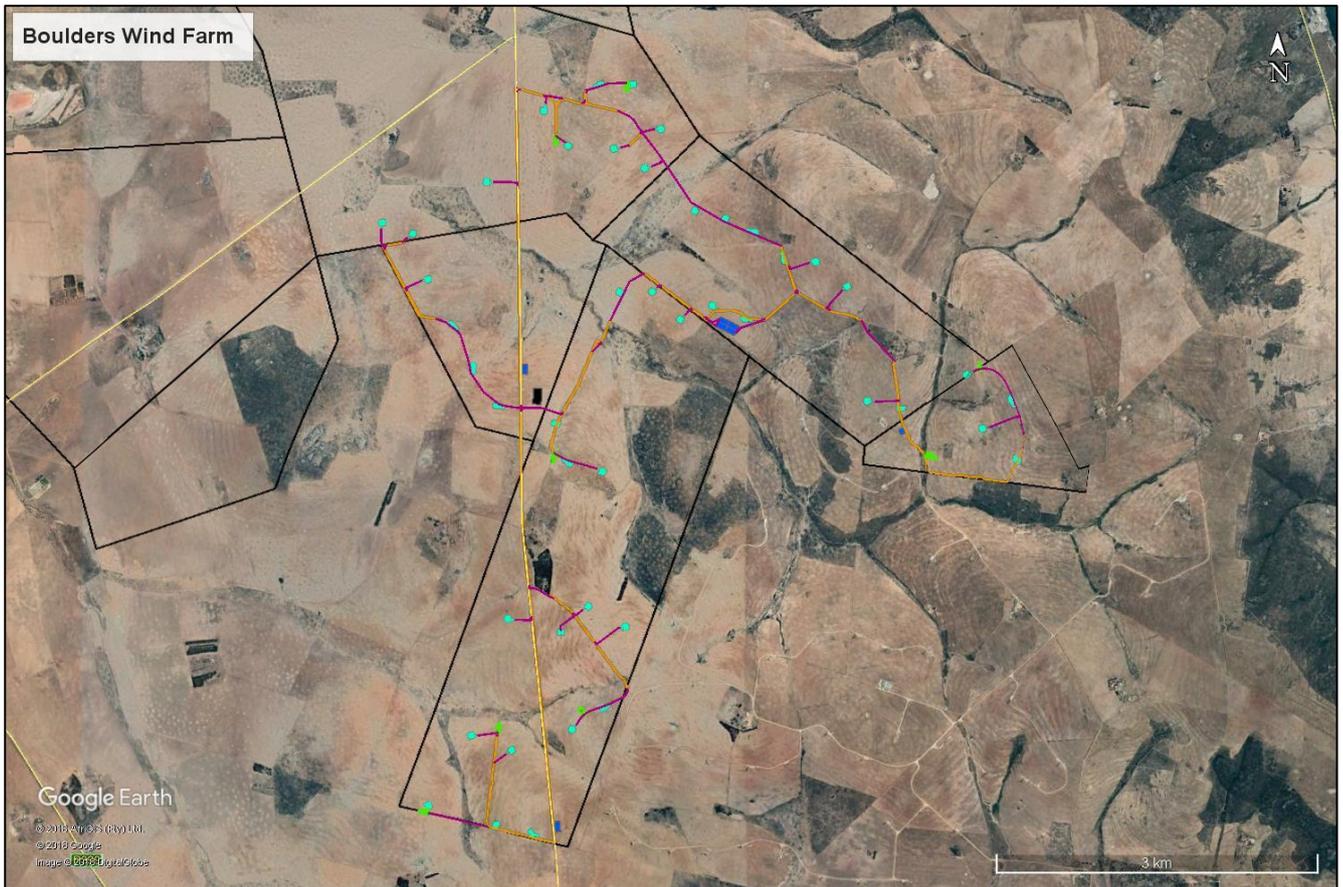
The proposed layout with crane pads and turbine sites (turquoise) and access roads, orange – existing road to be upgraded, purple – new road, bright green – temporary road, Laydown areas – blue polygon, sub-station – black polygon.
